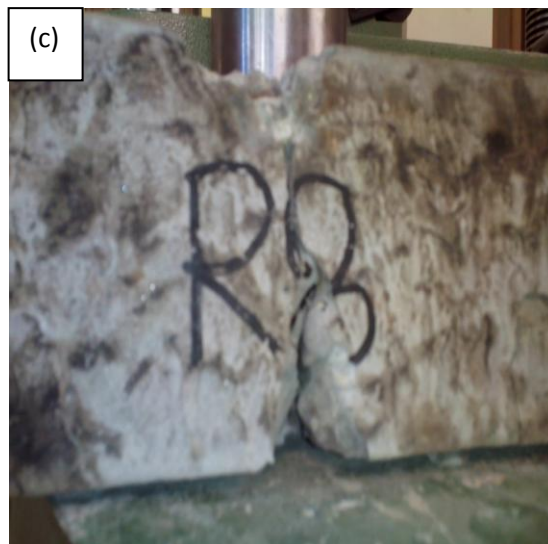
( a,b,c ) Failure of reinforced concrete beams.
